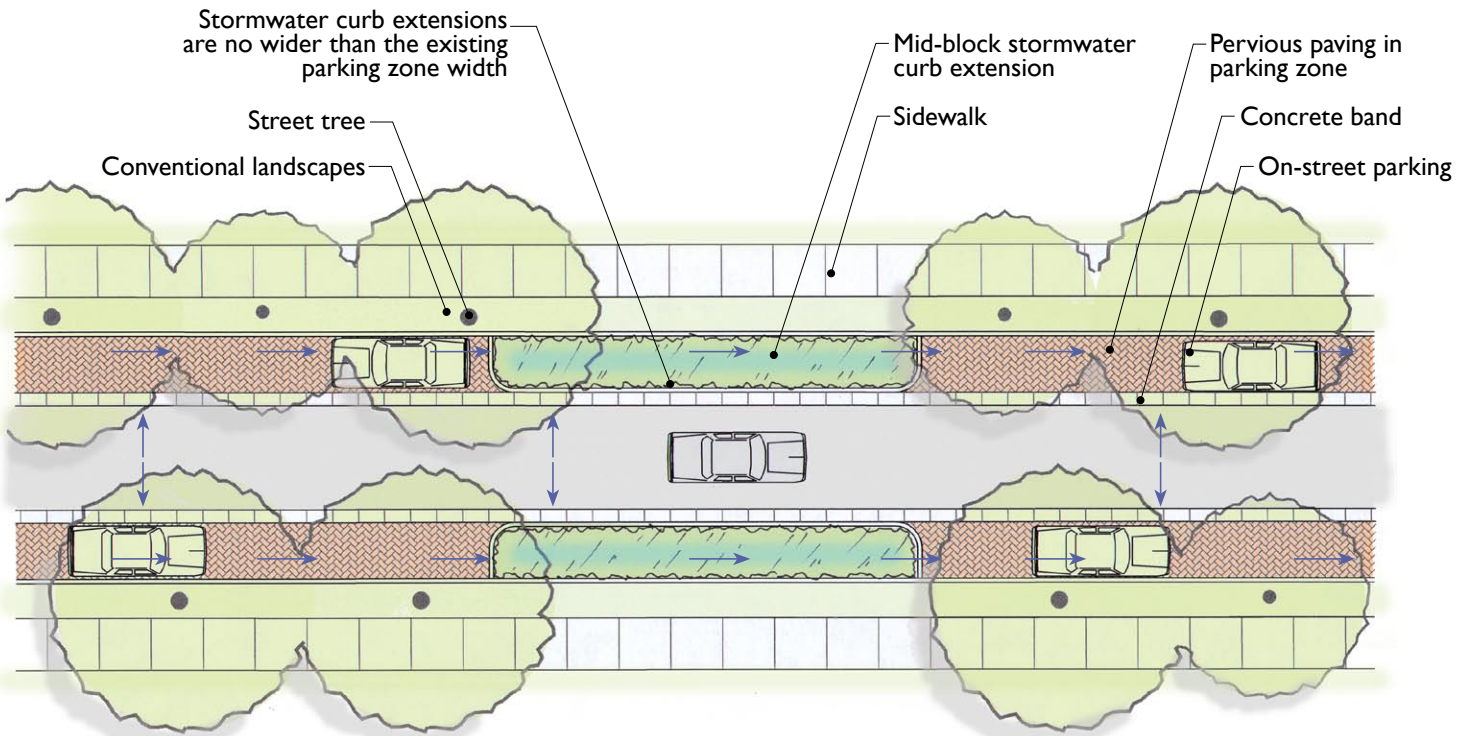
RETROFIT OPPORTUNITY: The same residential street retrofitted with mid-block stormwater curb extension, as well as an additional street tree.
